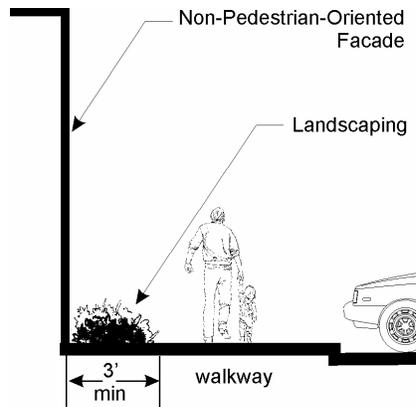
An example sketch of landscaping between buildings and walkways.
